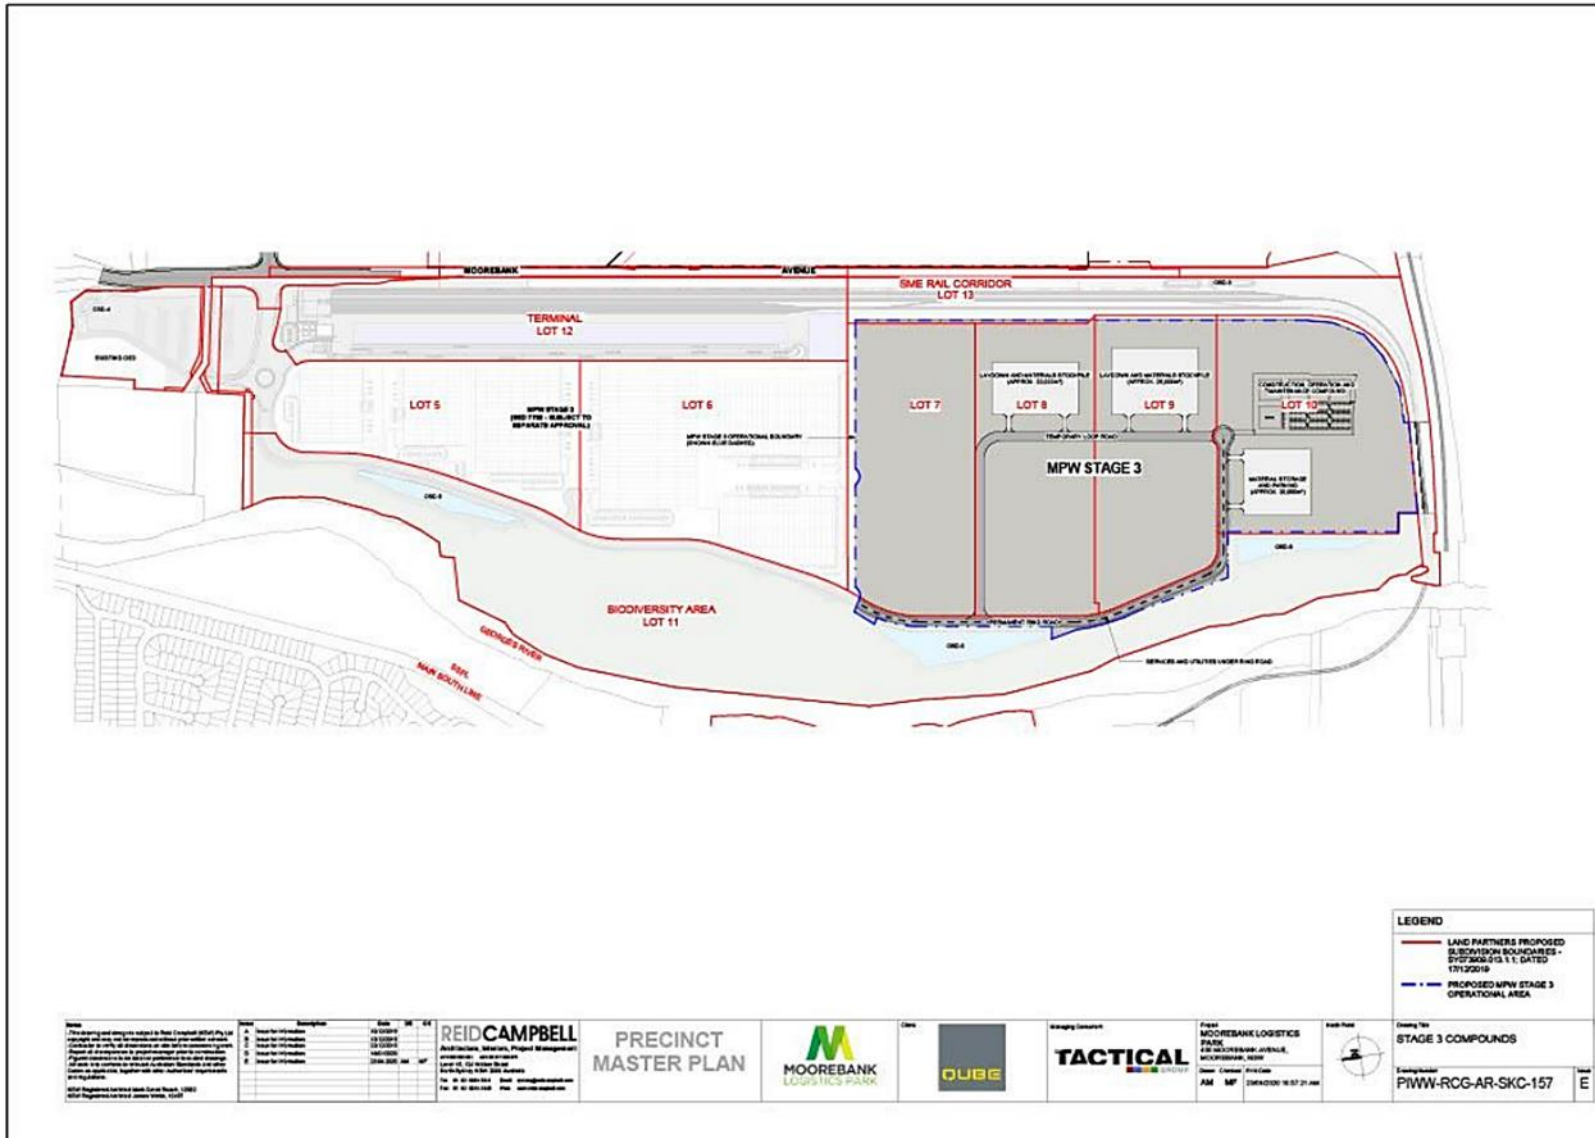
MPW3 Proposal Layout (Reid Campbell, 2020)
